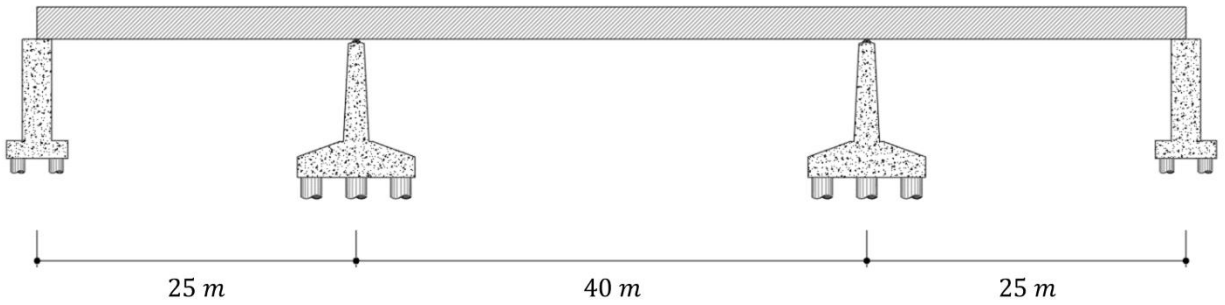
Case study 1: Multi-span continuous box girder bridge
